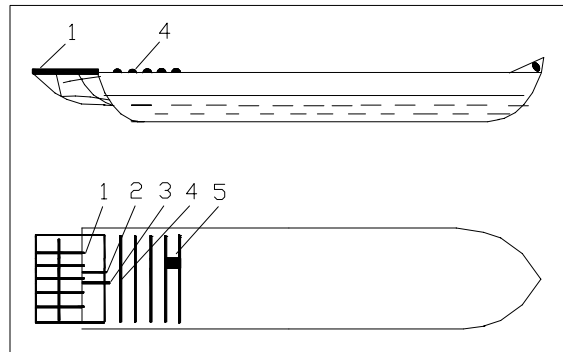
Layout of the drill site on steel barge (1-welded structure of angle steel and I-bar support, 2-hole site, 3-rig ,4-I-bar sill beam 5-water pump).
